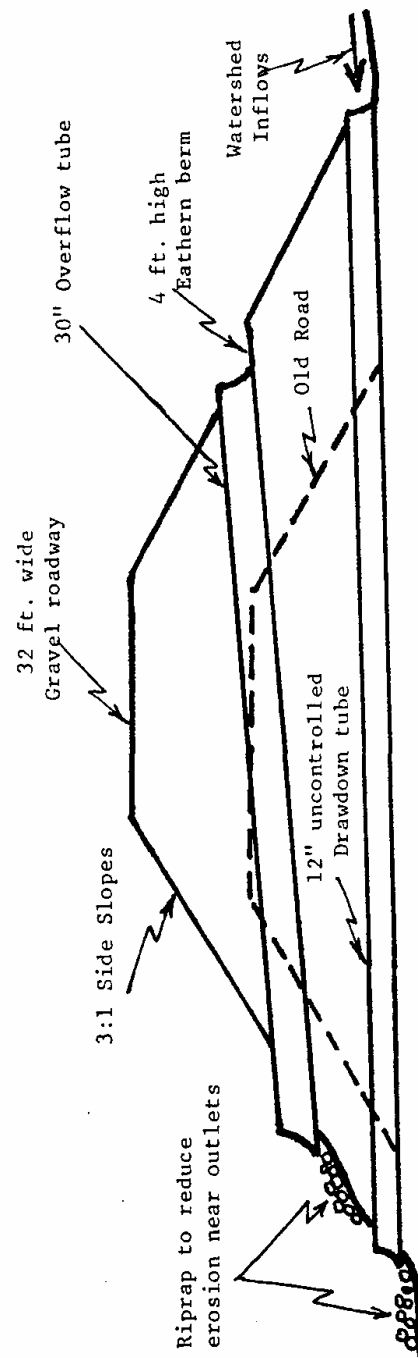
Schematic design of the existing road as redesigned to function as a sediment trap.
